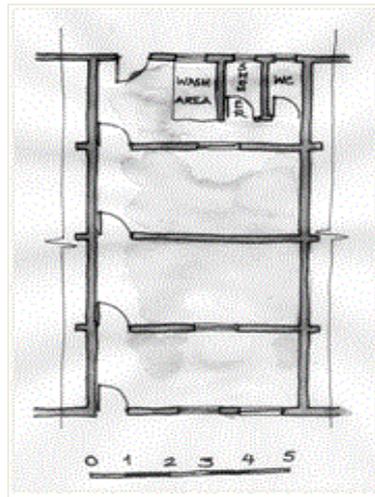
Part plan of a Deep strip house, which belongs to a single household. All the other households have a similar setup, which is parallel to this; see dashed lines in plan (figure 4.19).
